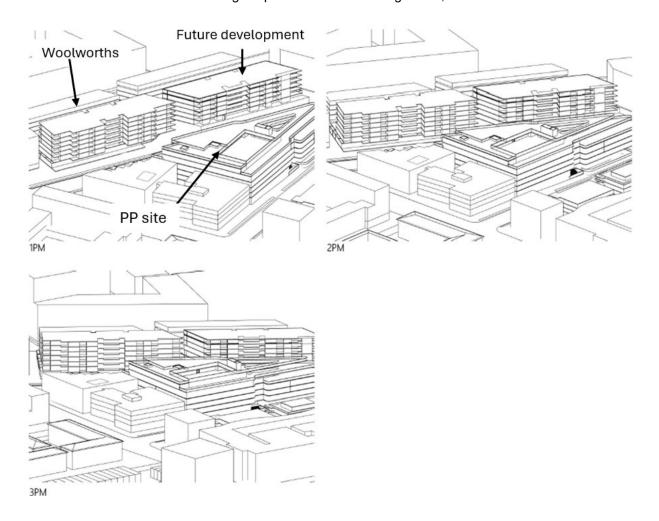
Overshadowing impact Young Street (sun eye view). Source: Plus Architecture Urban Design Report
